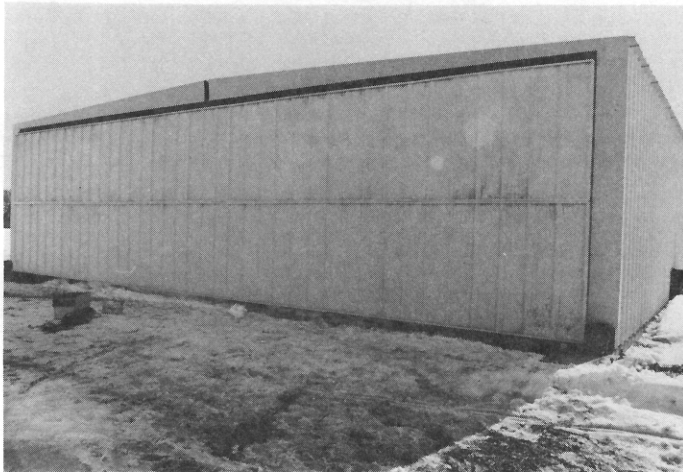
Rainout shelter structure showing steel siding and bi-fold door.
